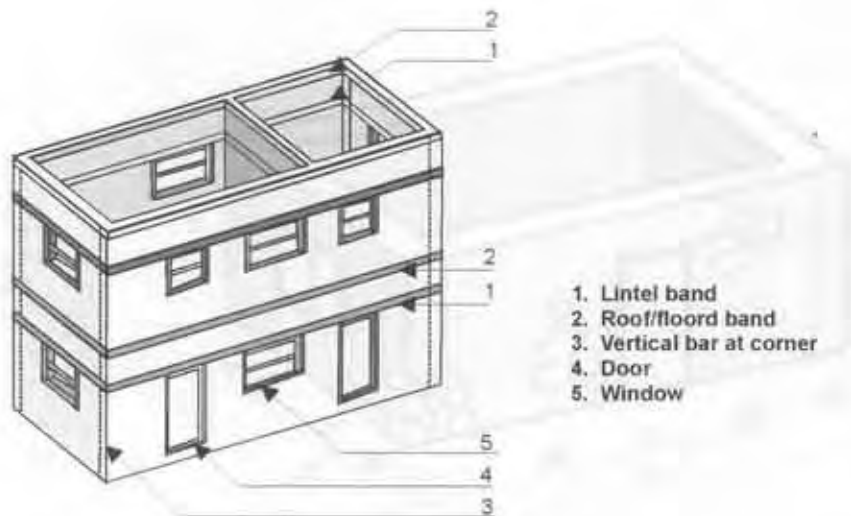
C Overall arrangement of earthquake resisting elements in double storeyed houses having flat roof (Roof not shown)
